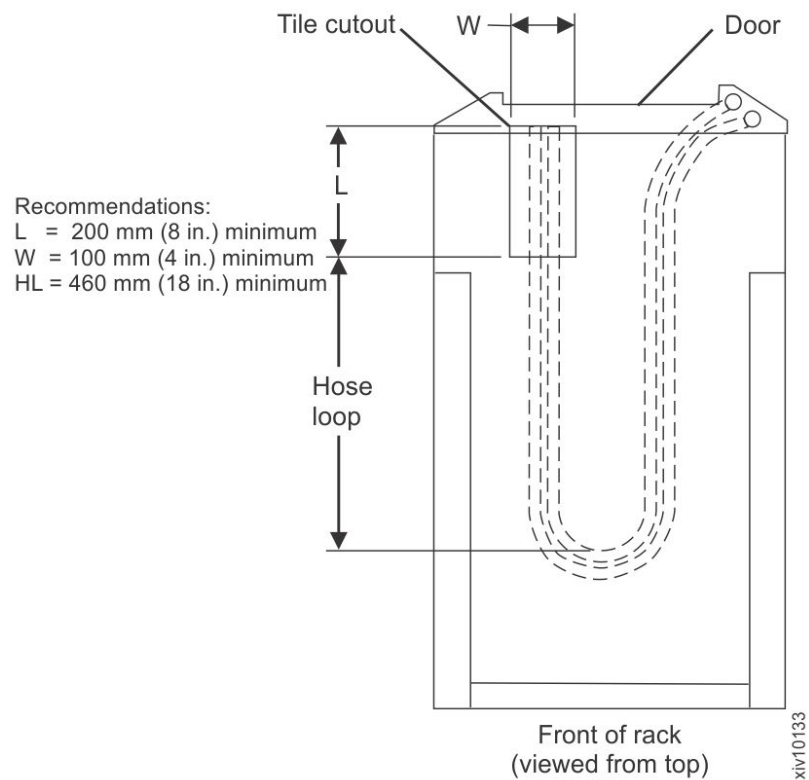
Raised-floor and non-raised-floor hose management example 2: loop under the rack with door closed
